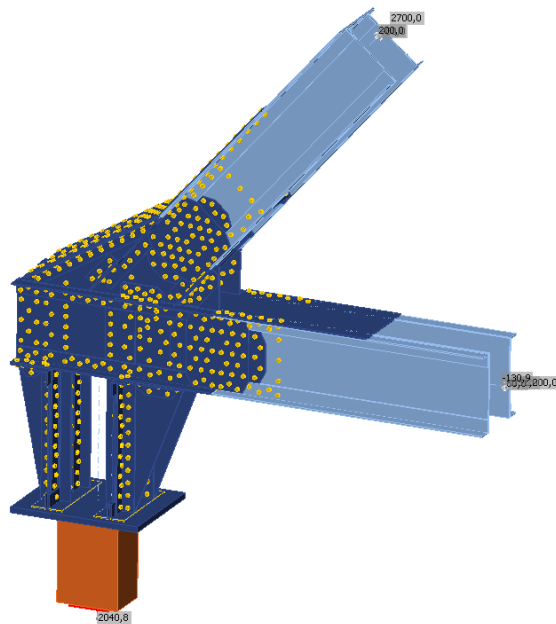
Connection from John S. Thompsonbridge, as constructed in IDEA Statica
